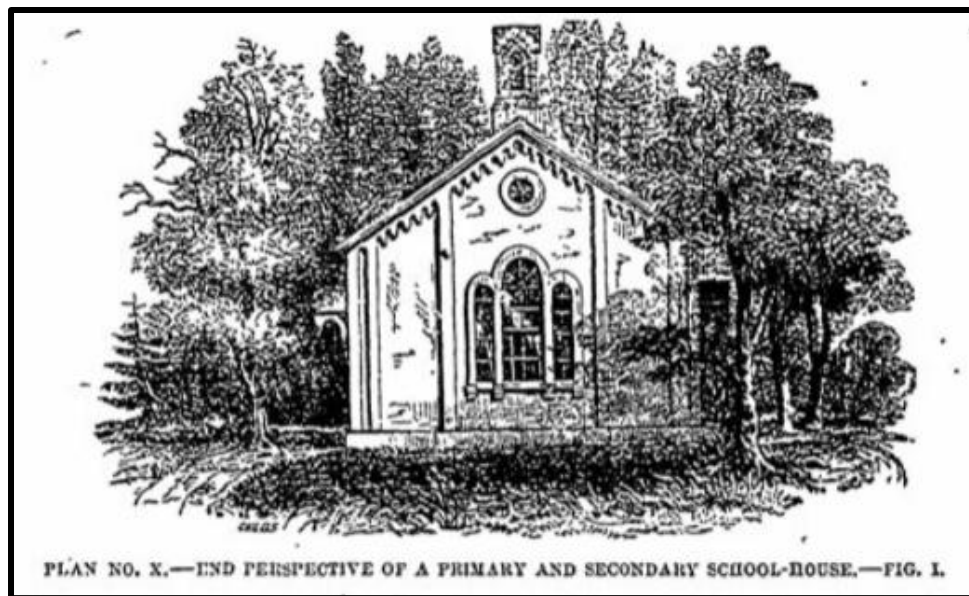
Sample Design of One-Room Tuscan-Inspired School House in *The School House: Its Architecture, External and Internal Arrangements* (Hodgins 1857:35)
